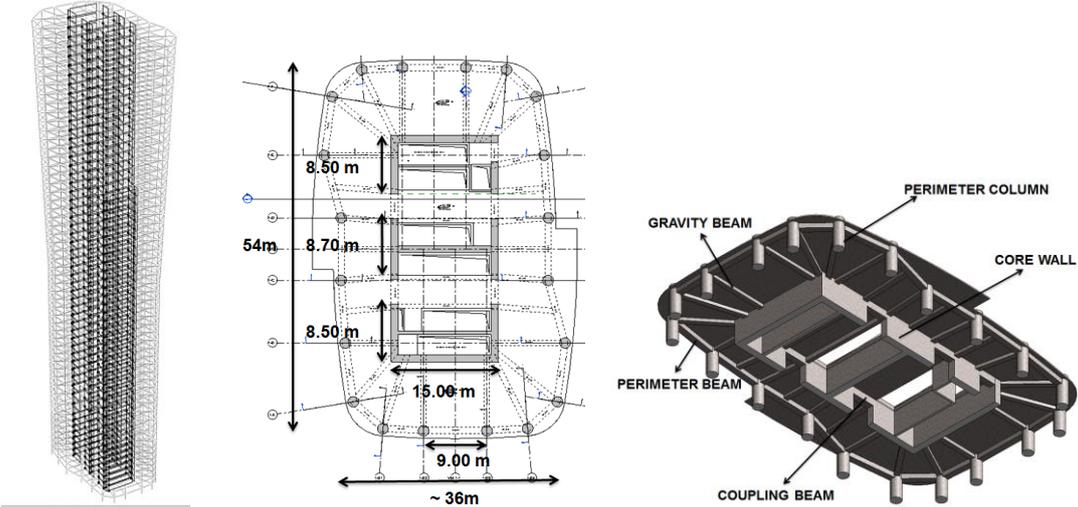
46 story reinforced concrete core wall building (a) perspective view; (b) typical plan and (c) structural key elements
